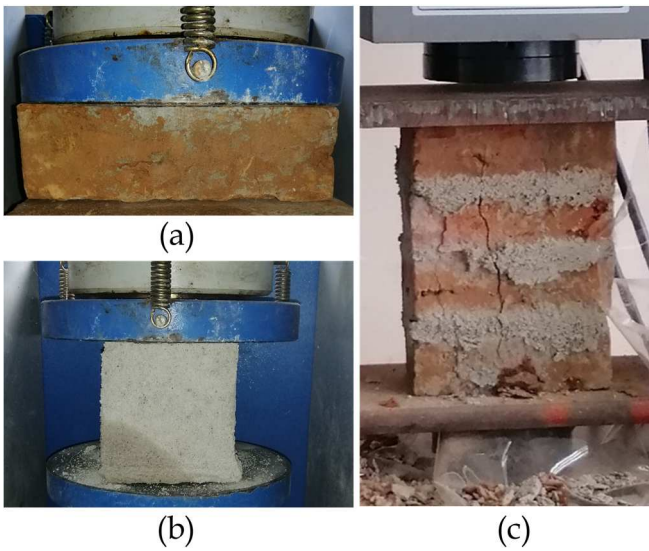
The testing set for compression test on (a) brick, (b) mortar, and (c) masonry
